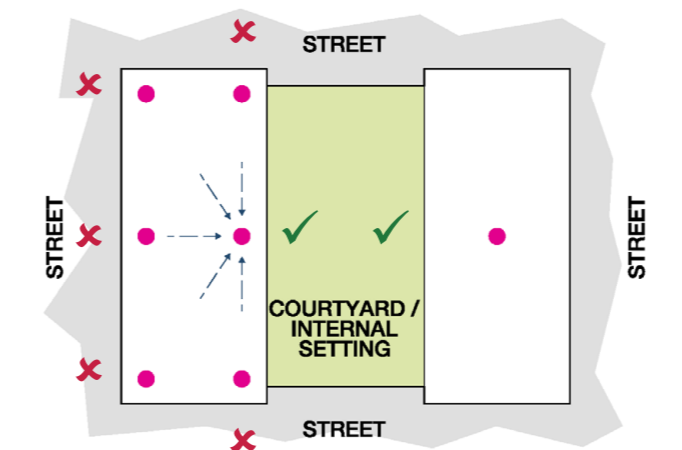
Positioning of flues & chimneys within a multi-building plot-plan.
